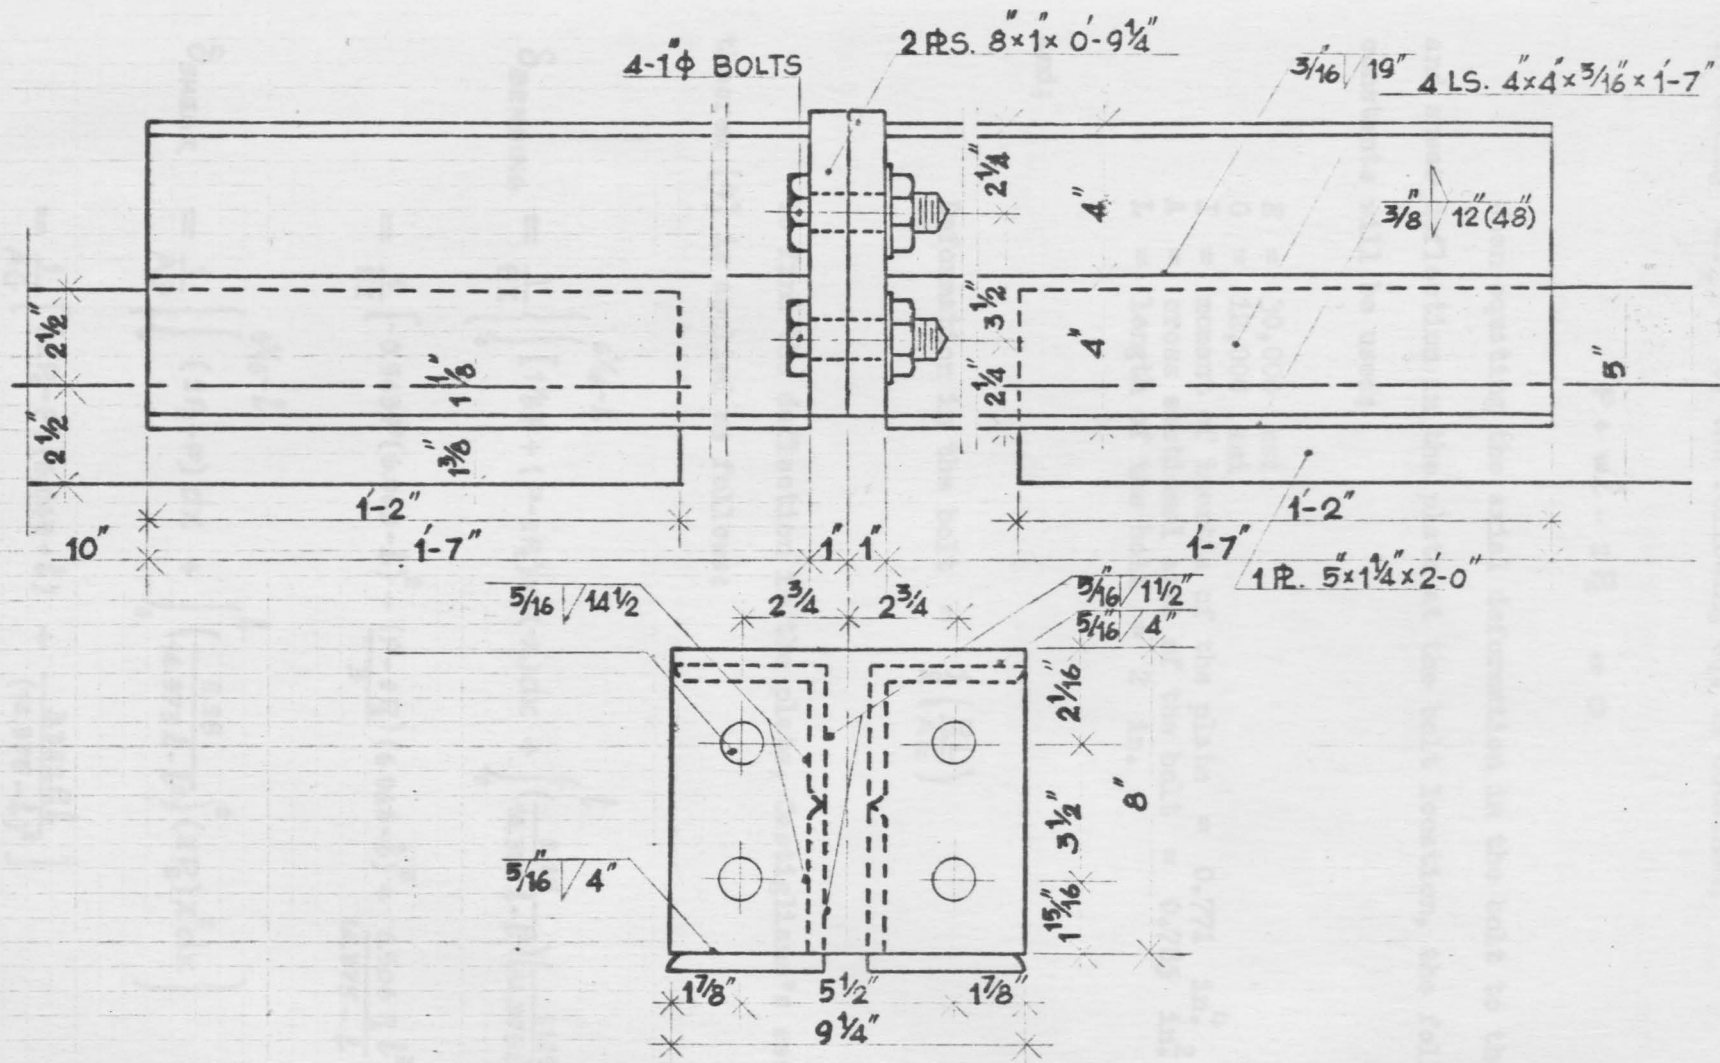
DETAILS OF FOUR BOLTS SPECIMEN
